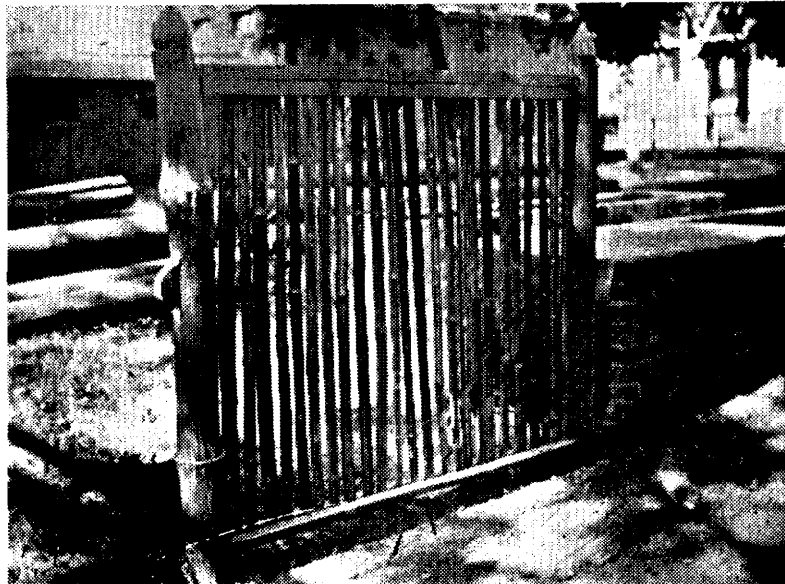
Treated split bamboo pale fencing at F.R.I.
